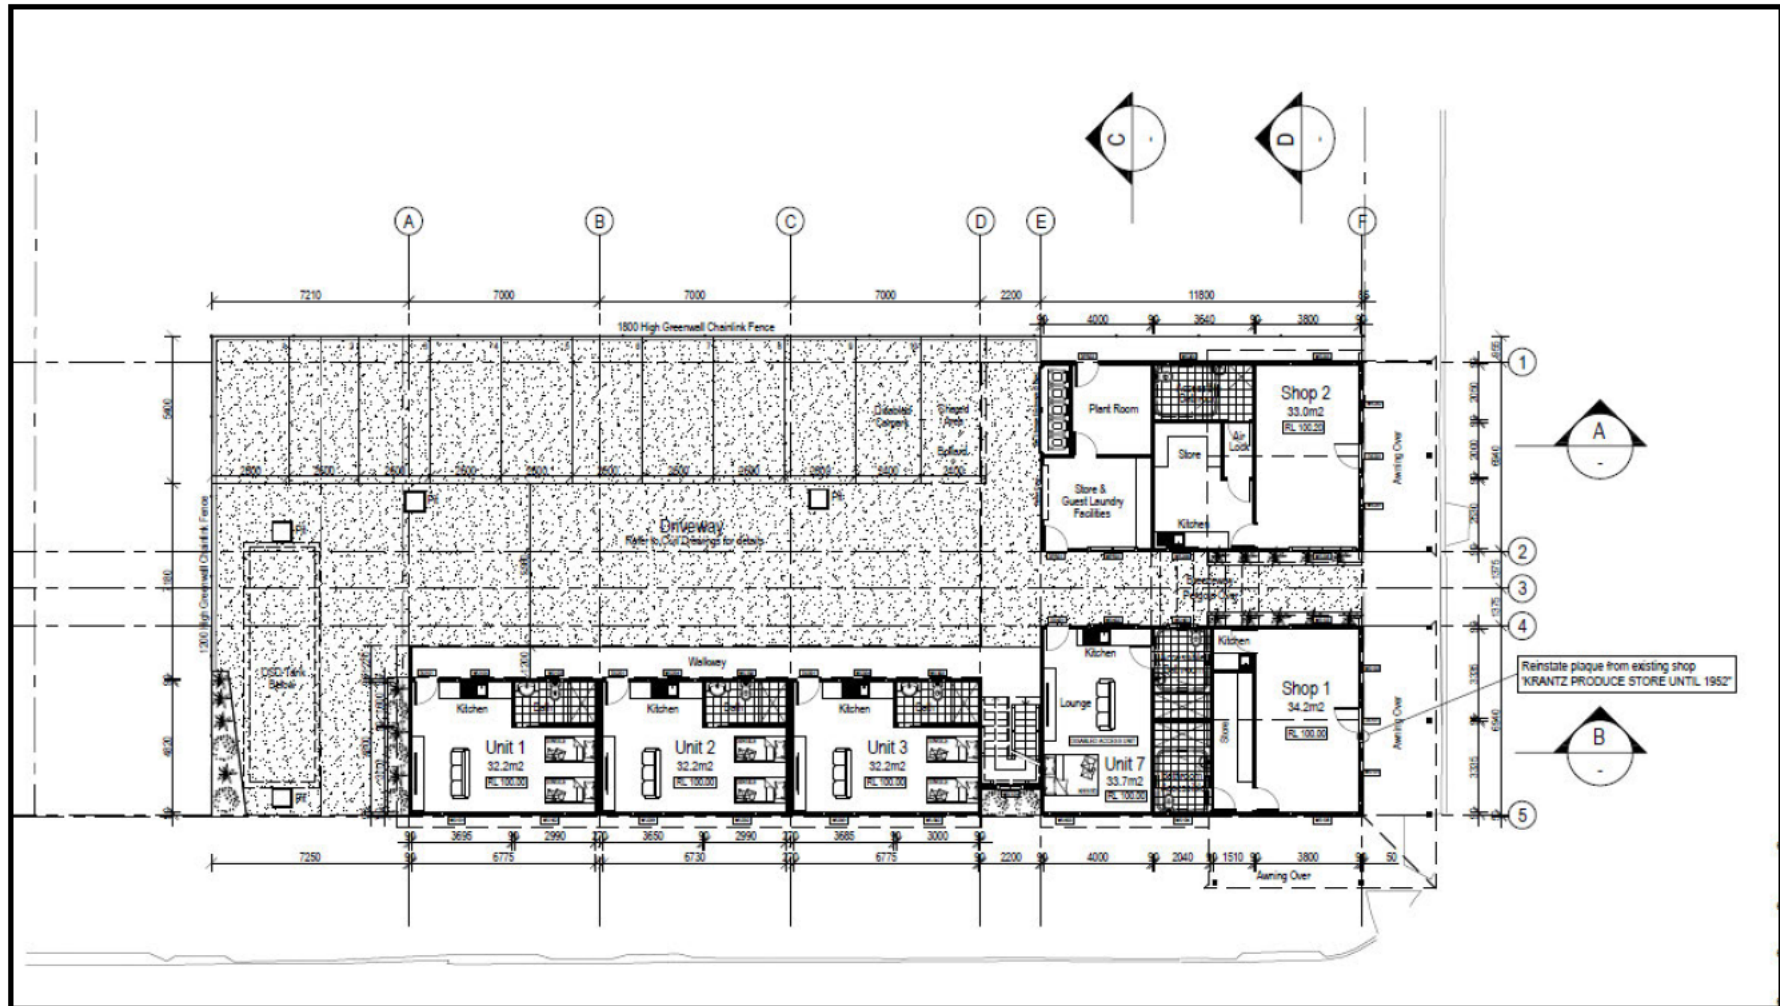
Proposed first floor plan (Source: CAD Design and Draft Pty Ltd, 2023)
